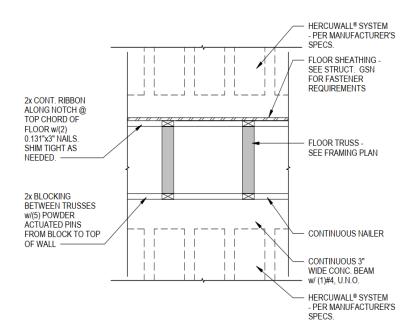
HercuWall® Truss Perpendicular to Wall (Elevation)
